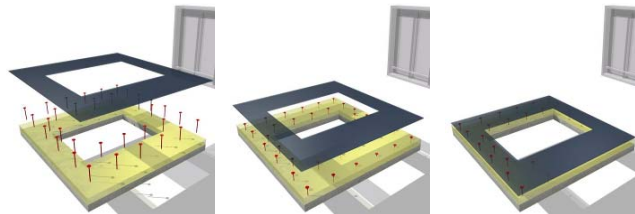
Anchors and slab and facade panel will be bonded together during assembly by adhesives
